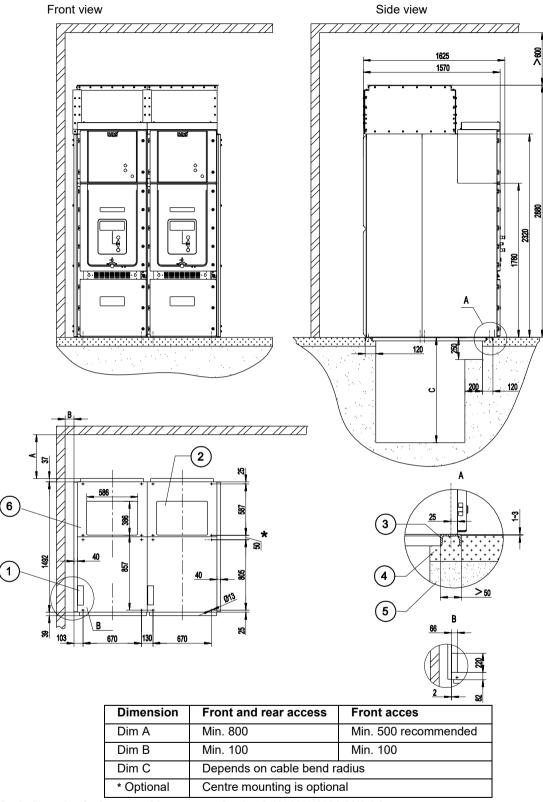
Basic floor plan for bottom cable entry panel rating 24kV 800/1250A 20/25kA
